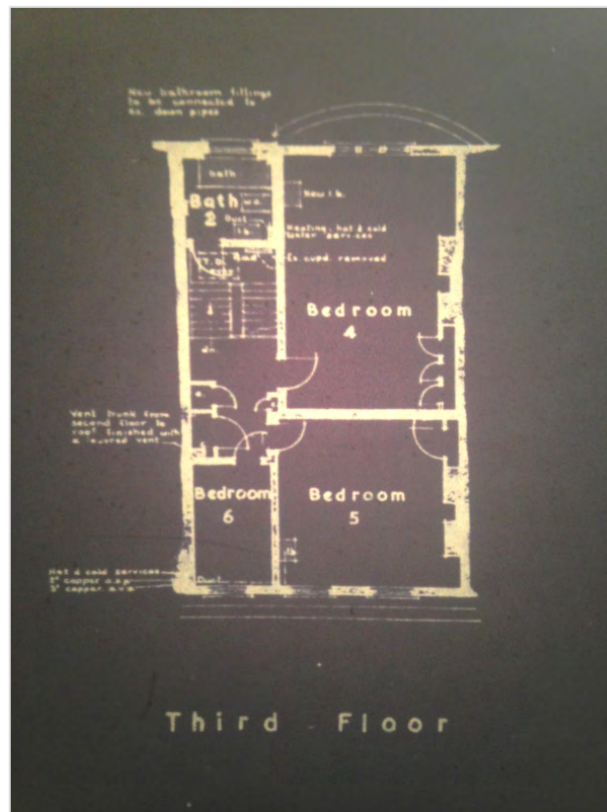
1950s Drainage Plan (Third Floor)²⁴
